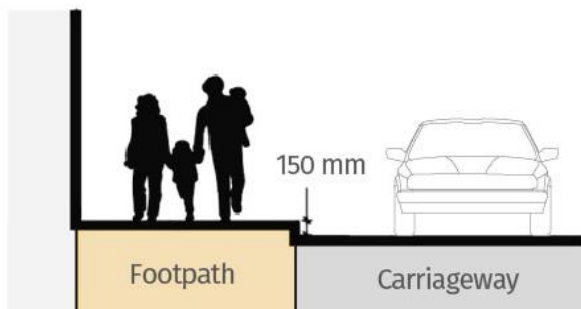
Footpaths should be raised +150 mm above the carriageway to prevent the accumulation of storm water and debris. A cross slope of 1:50 is required.
